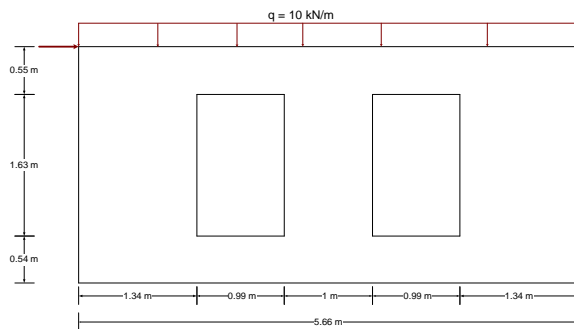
Wall 4: Irregular wall with $i_o = 0.35$
